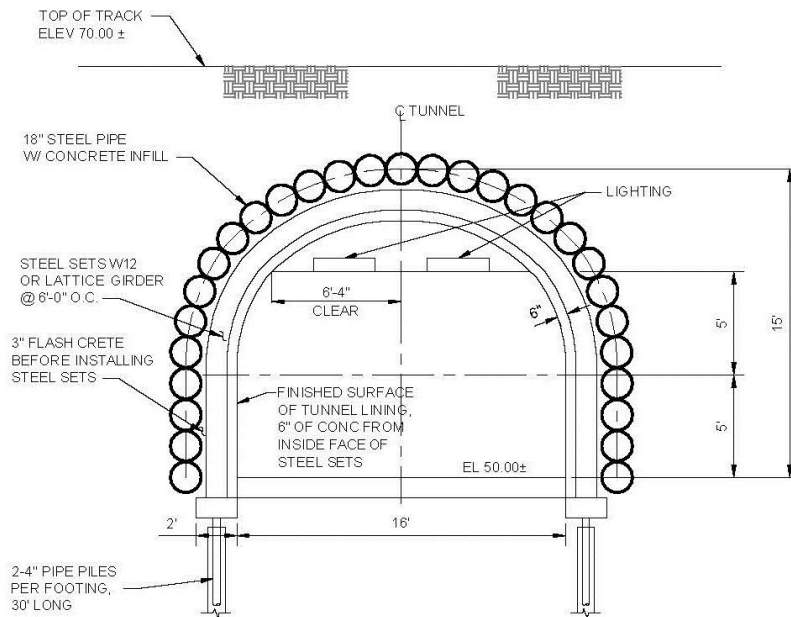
Typical Pipe Arch Roof Tunnel Section A-A
